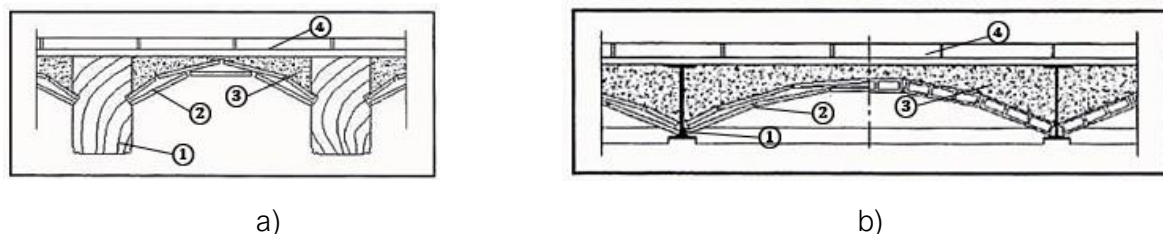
Typical one-way floors in the *Eixample* district of Barcelona: a) timber beams with tile barrel vaults, and b) steel beams with tile barrel vaults (adapted from Paricio Casademunt 2001).
